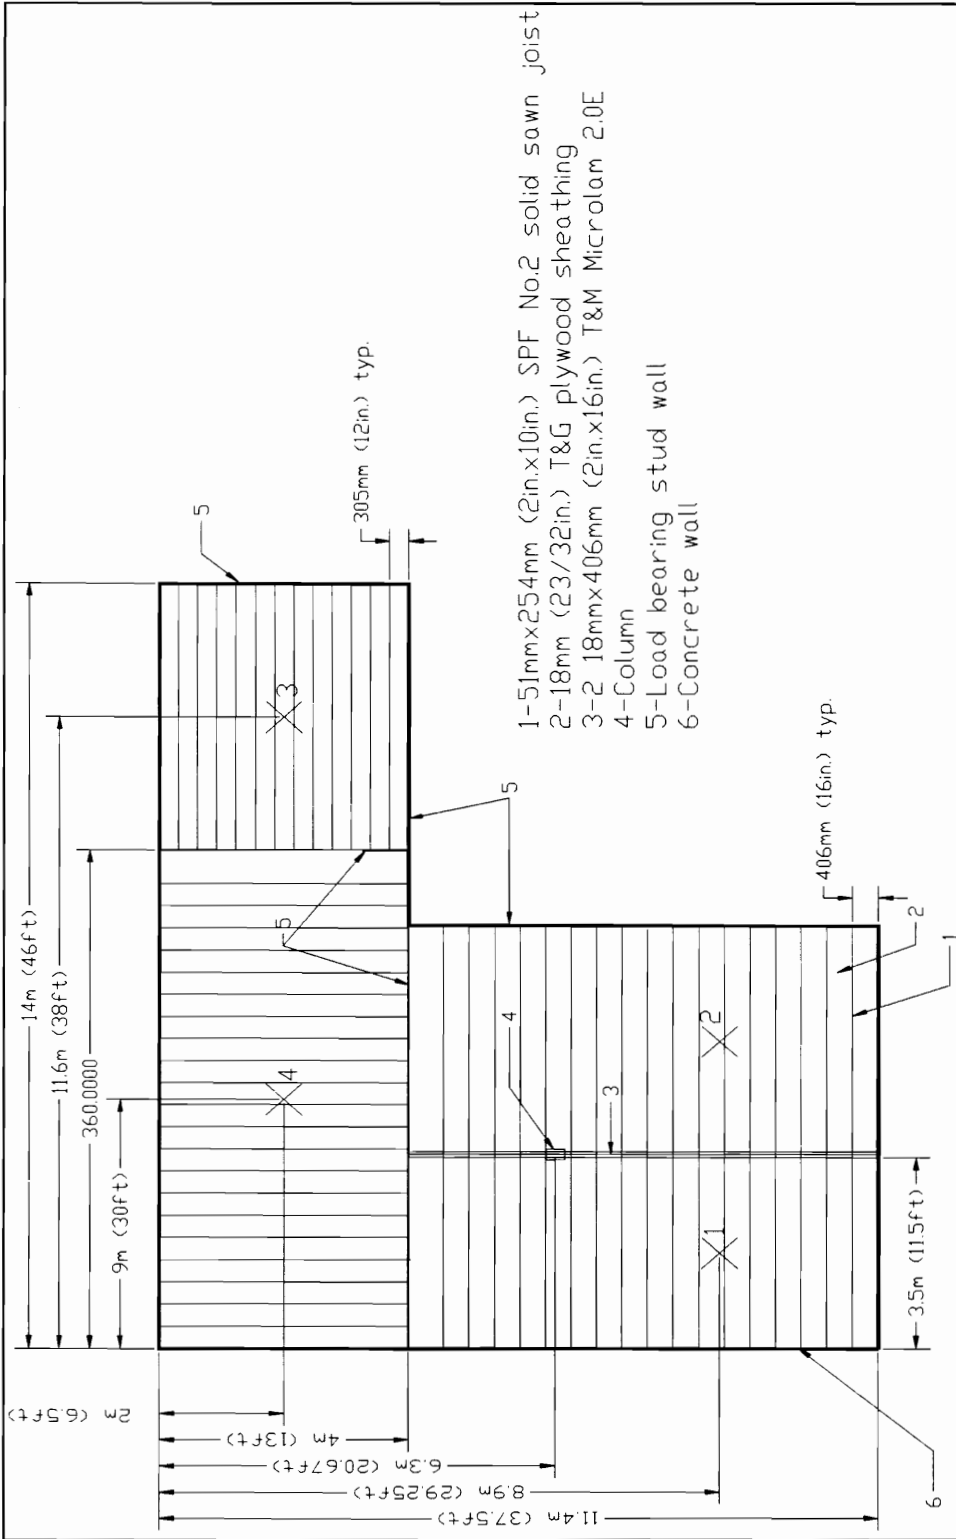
Structural Plan of Solid Sawn Joist House #2
